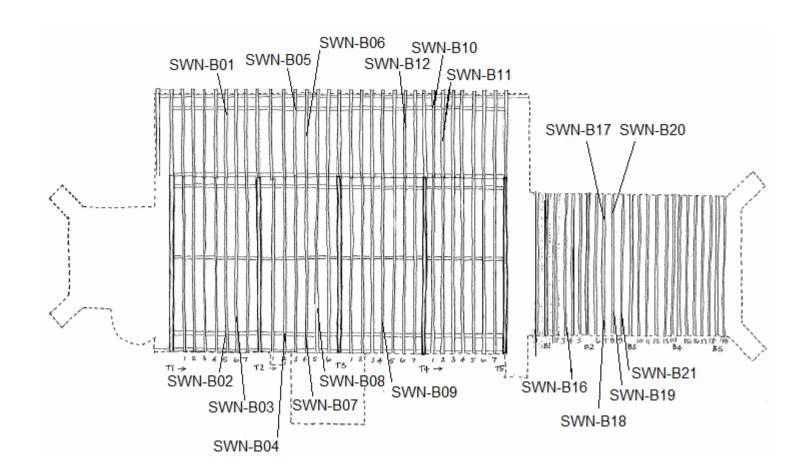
Plan of roof frames, showing the location of samples SWN-B01–12 and SWN-B16–21 (Thomas Ford & Partners)
